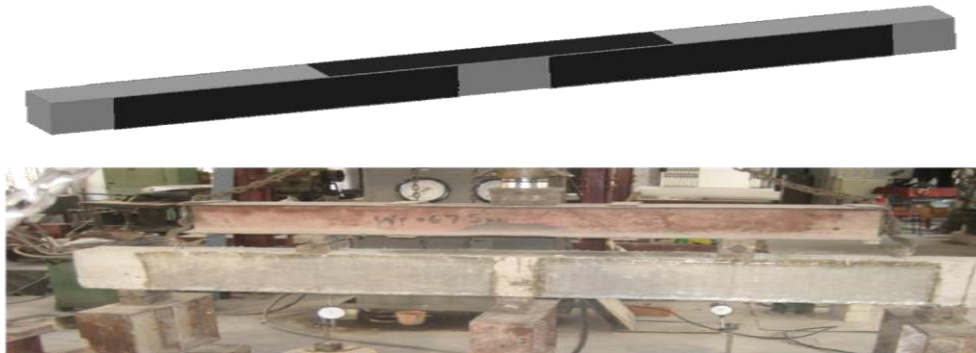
U-jacketed GFRP wrapped on the Beam SB3
